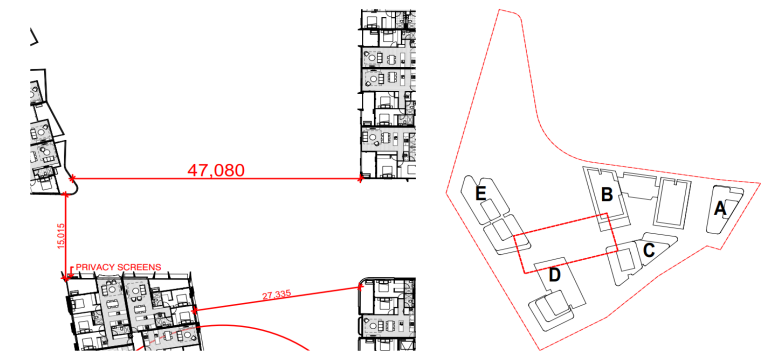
F1.3 Building B-E separation (storeys 1-9) & Key Plan
